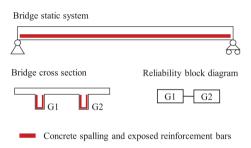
Bridge static system and cross section, with areas of concrete spalling and exposed rebars highlighted.
